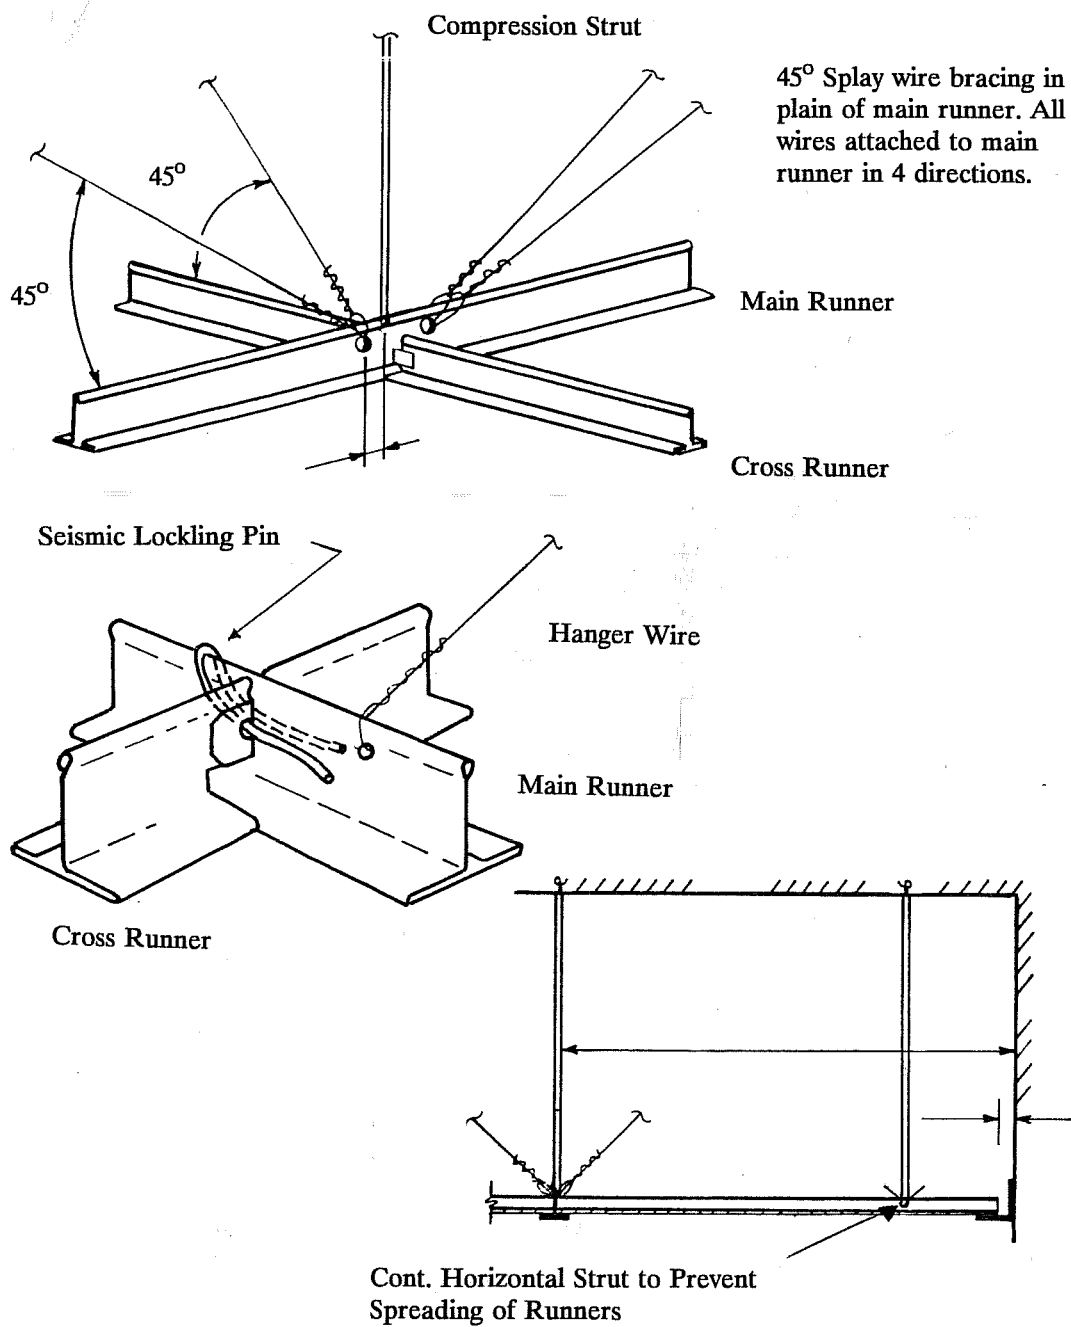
Bracing Details for Suspended Ceiling Systems (Ref. 4)
